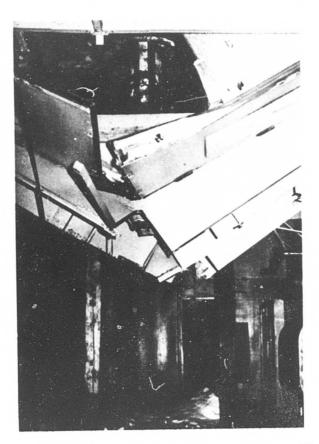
Ceiling cave-in at vent stack, Trench 15.
